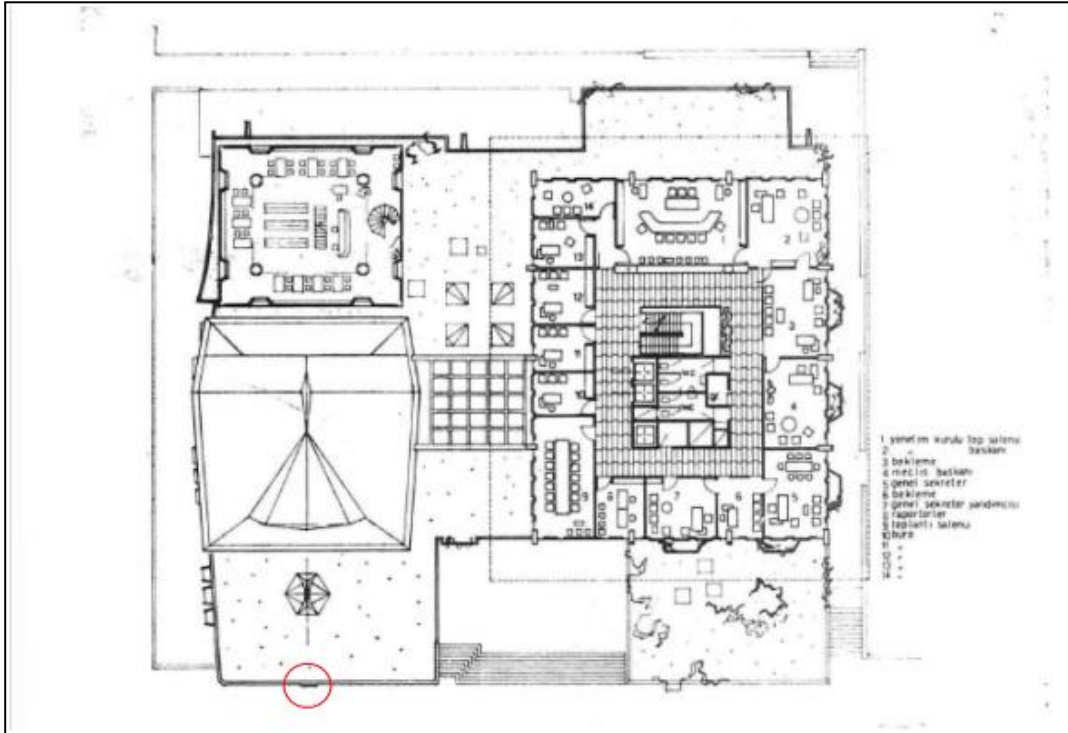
First floor plan, İstanbul Chamber of Commerce Building
